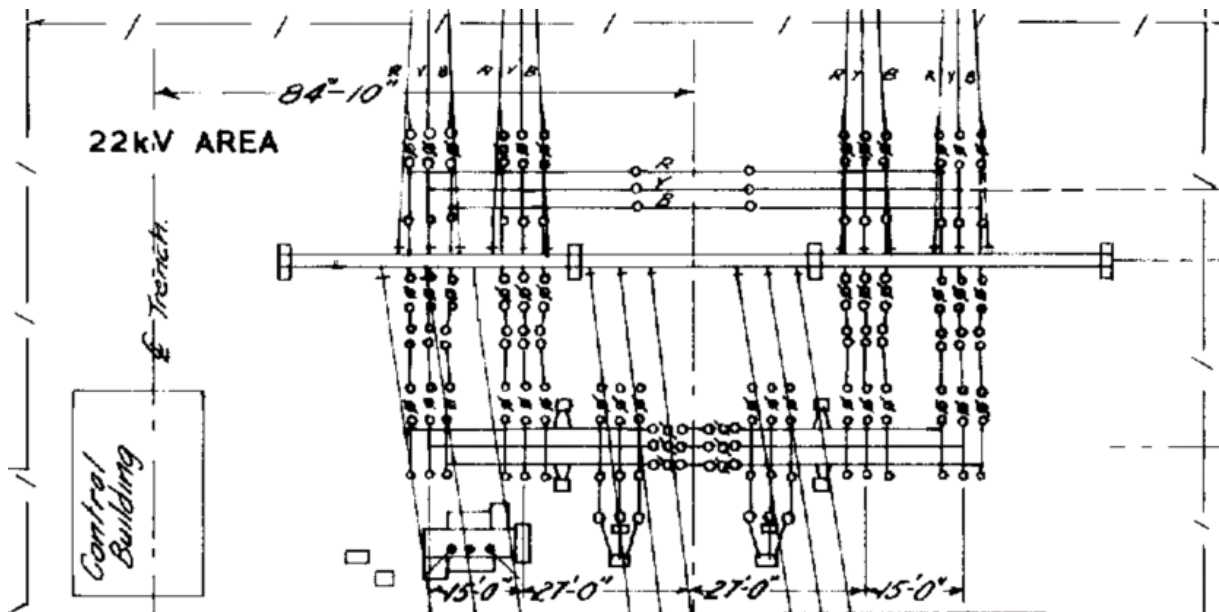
A Section of a hand drawn 22kV Nevertire layout drawing.
